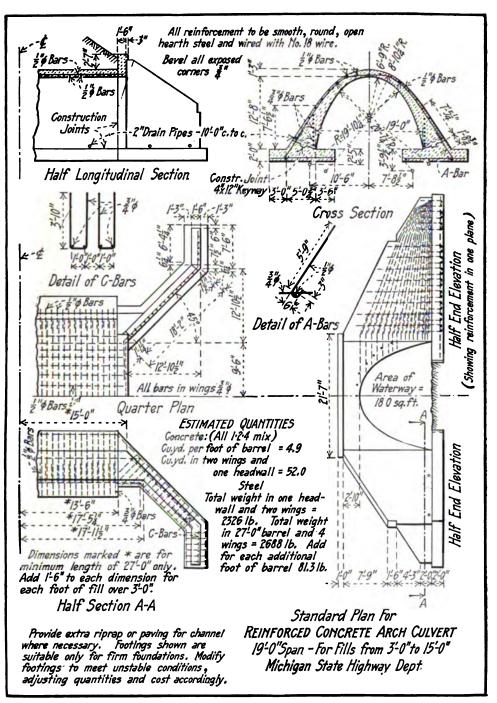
REINFORCED CONCRETE ARCH CULVERT.
